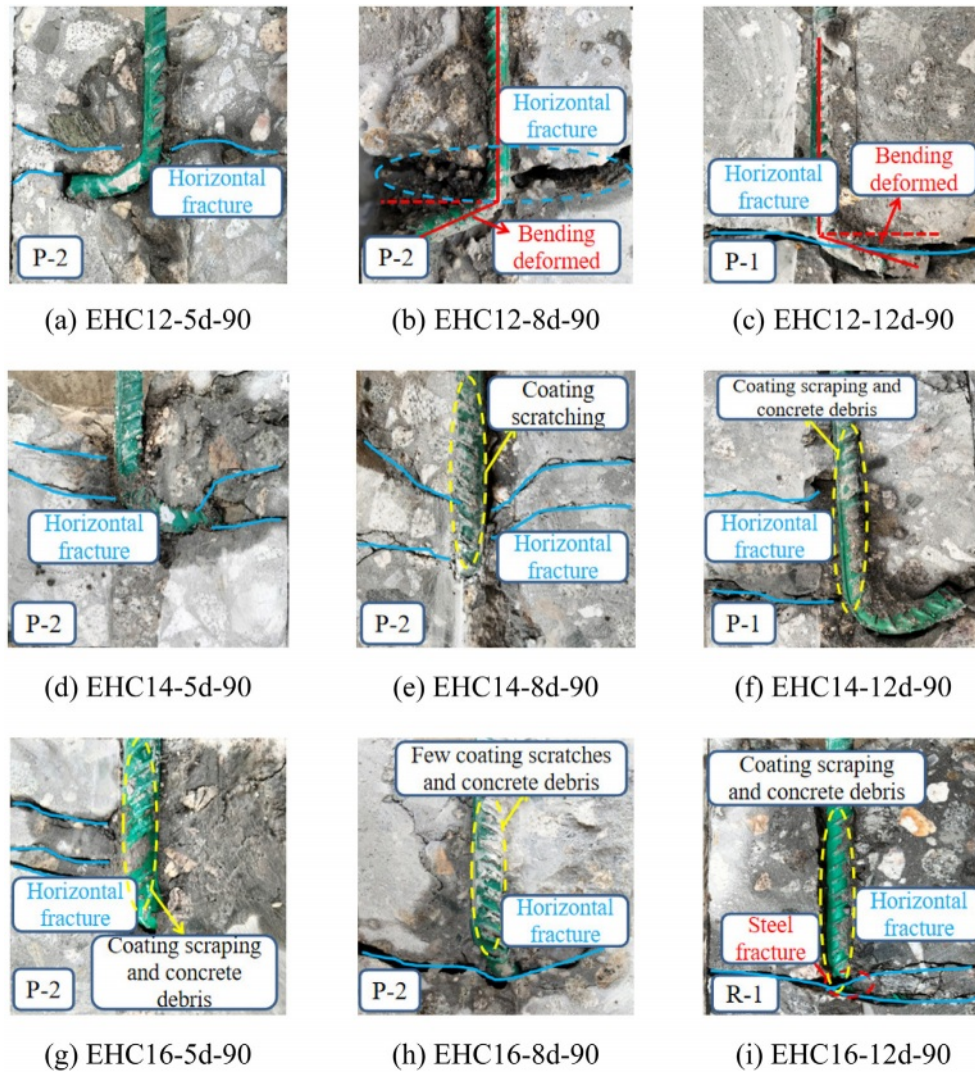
Failure pattern of rebar specimens with bending angles.
